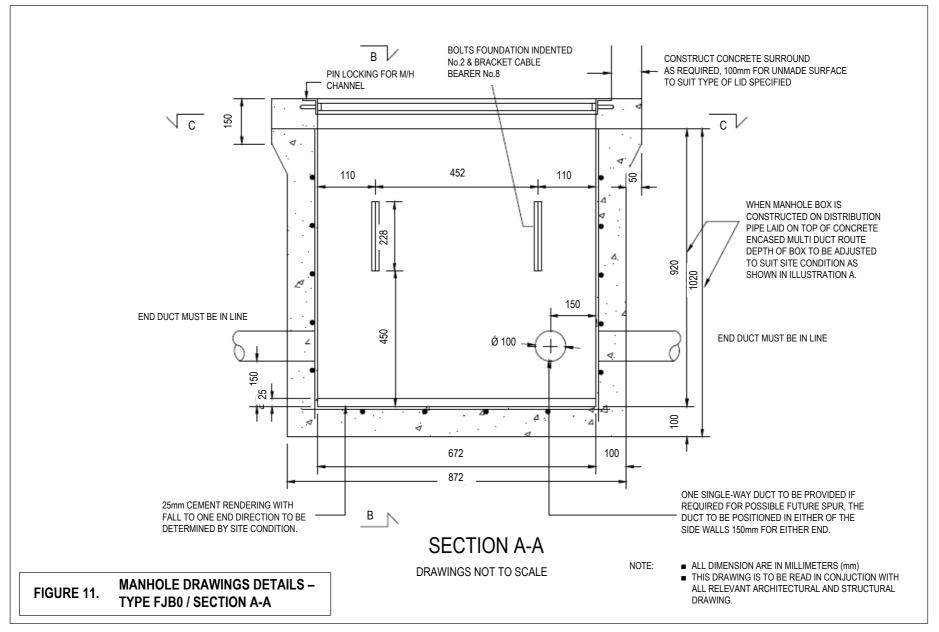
Manhole drawings details - Type FJB0 / section A-A
